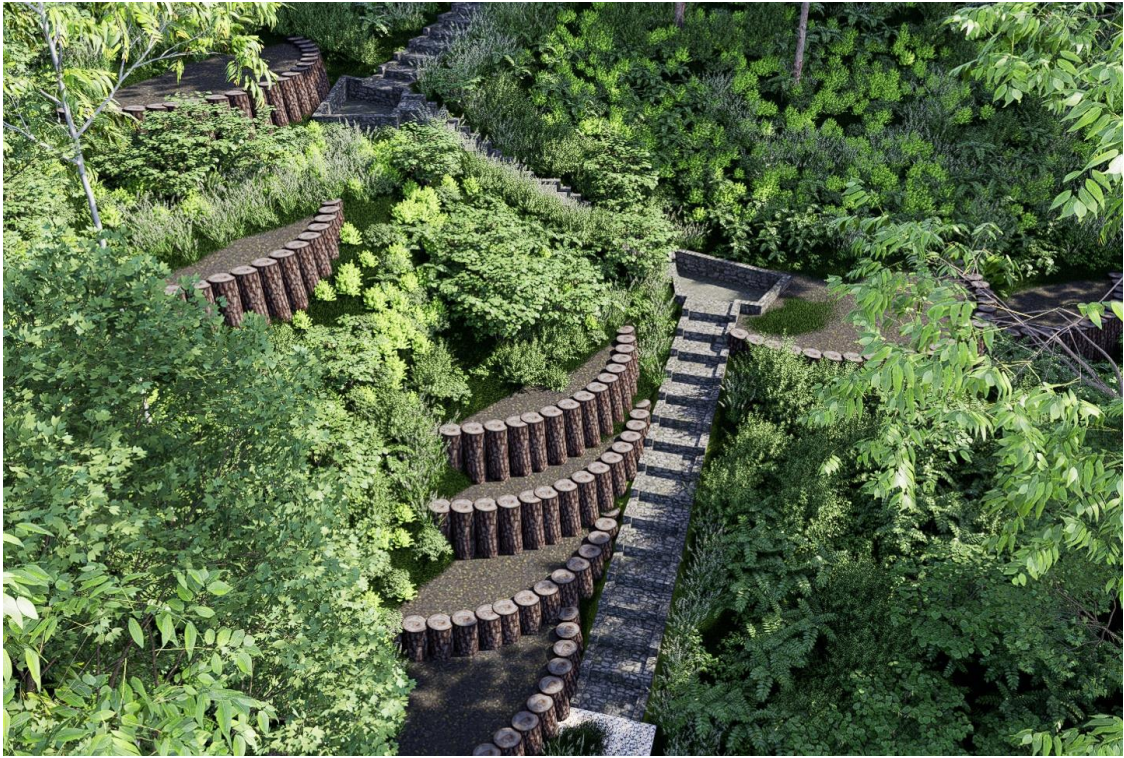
2nd stilling pond, followed by 2nd water stair section to the 3rd stilling pond and 3rd water stair section.
